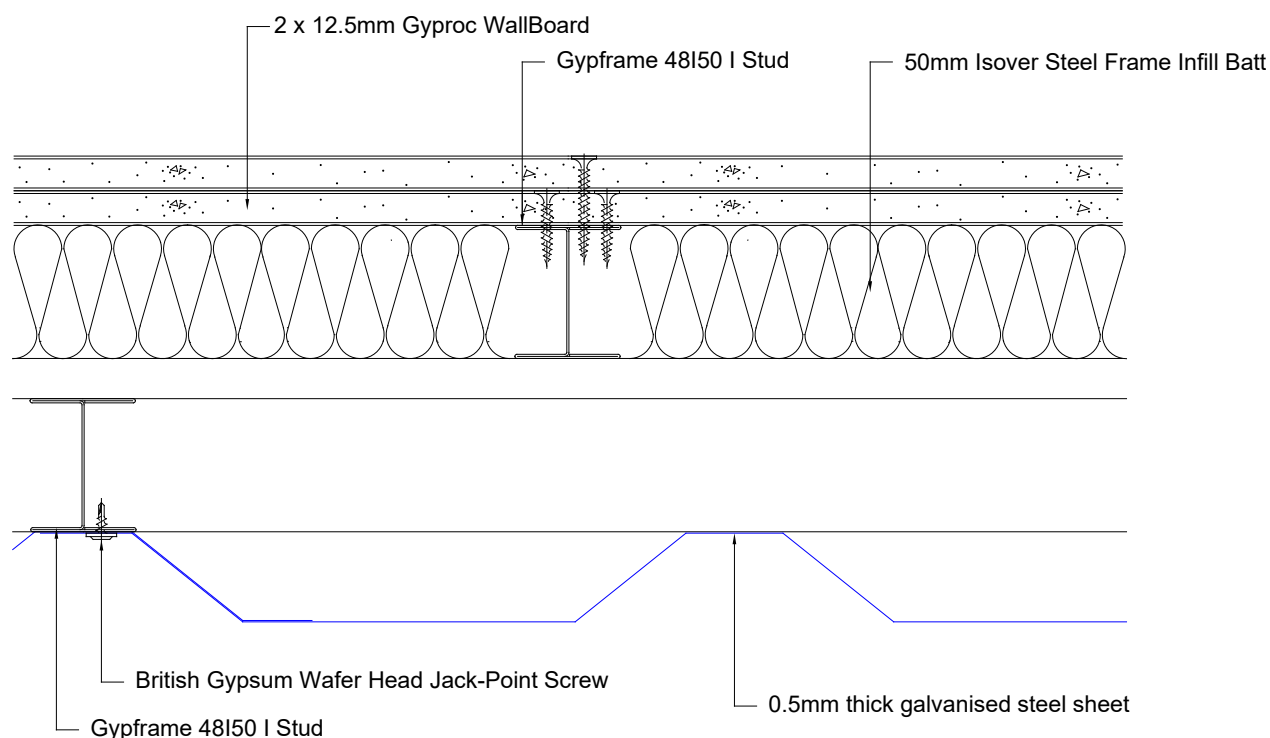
Horizontal cross section – GypLyner IWL metal stud partition with 48 mm stud framework clad on the exposed side with a double layer of 12.5 mm Gyproc WallBoard 12.5mm with 50 mm Isover Steel Frame Infill Batt in the cavity and galvanised steel cladding on the unexposed face.
